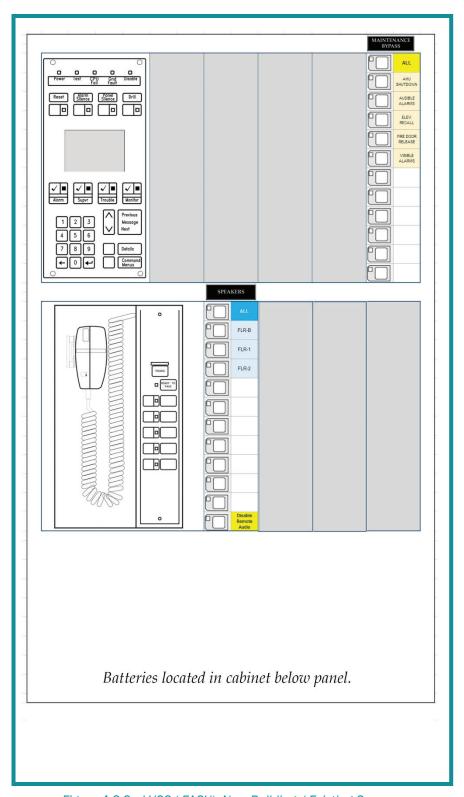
C.2 – LVCC (FACU) New Building / Existing Campus
